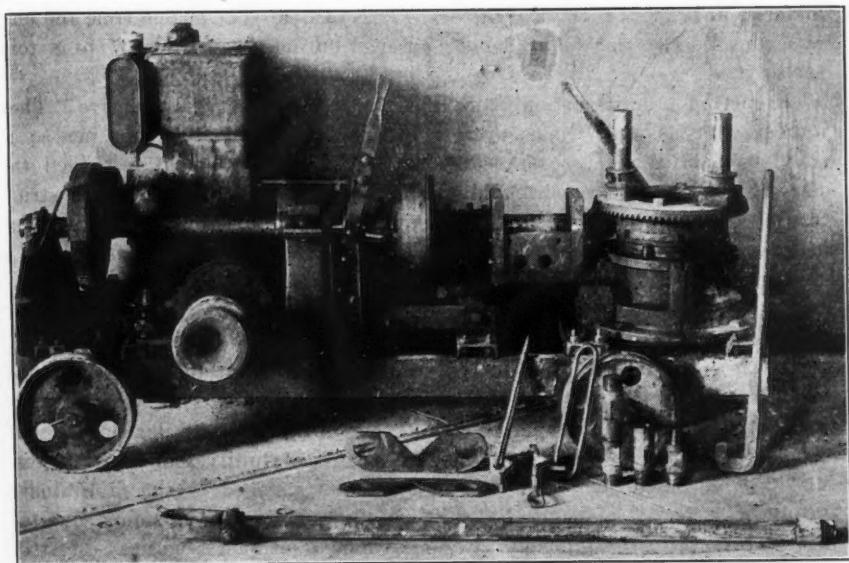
VIEW OF BORING AND SAMPLING MACHINE.
